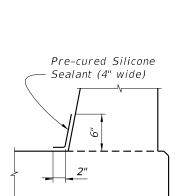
DETAIL "B" - SECTION AT INTERMEDIATE OPEN JOINT
